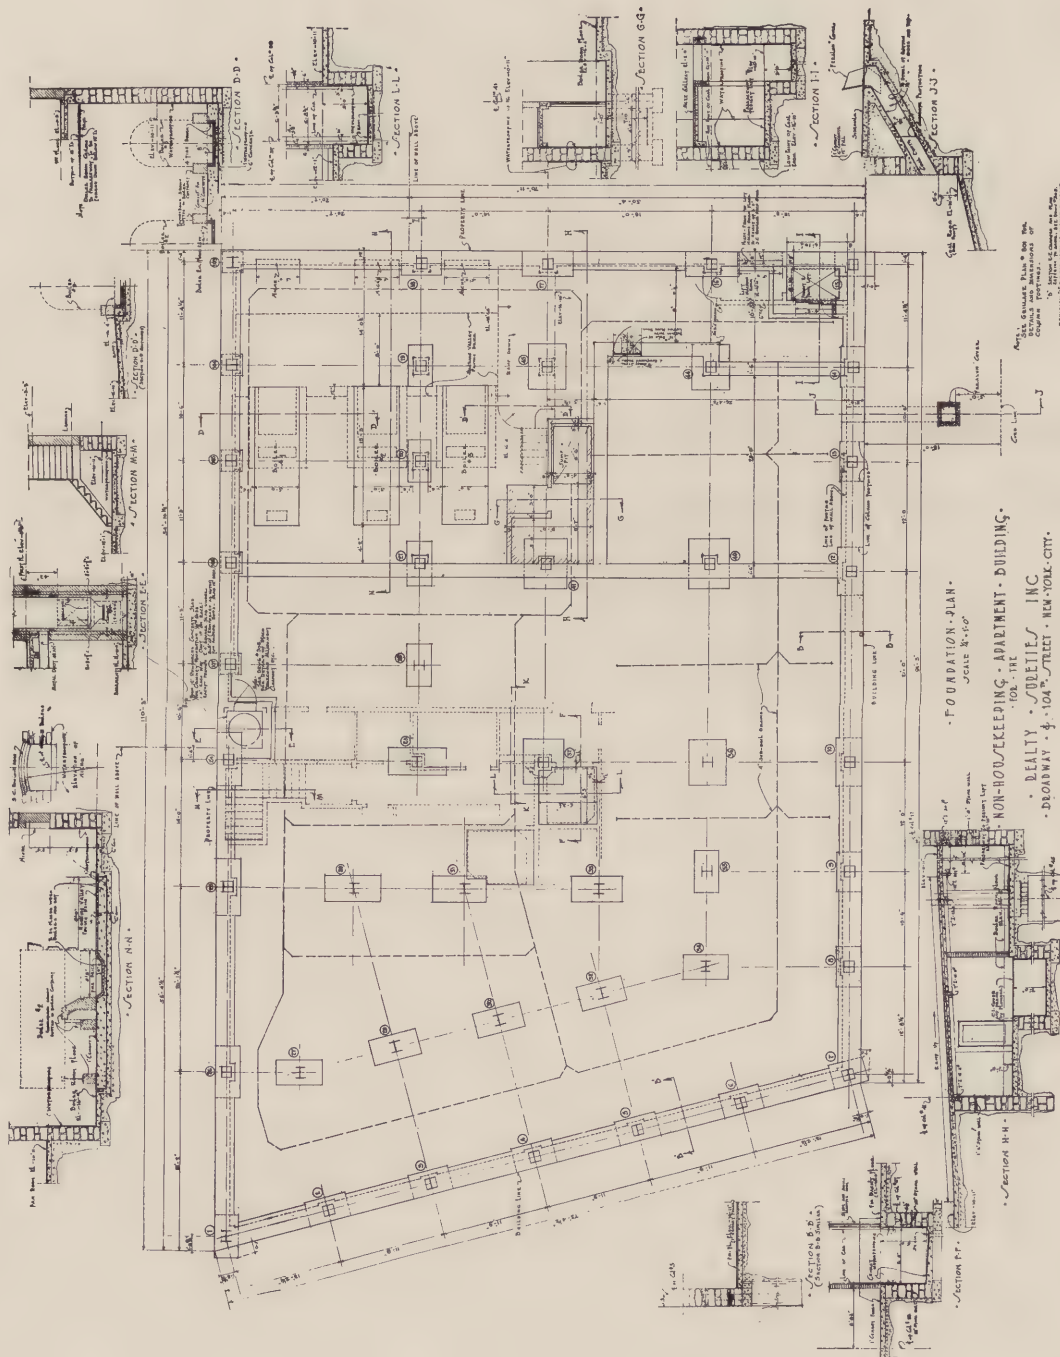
Foundation Plan, Non-housekeeping Apartment Building for Realty Sureties, Inc., New York City. Carrere & Hastings, Architects. Shreve, Lamb & Blake, Associated.
